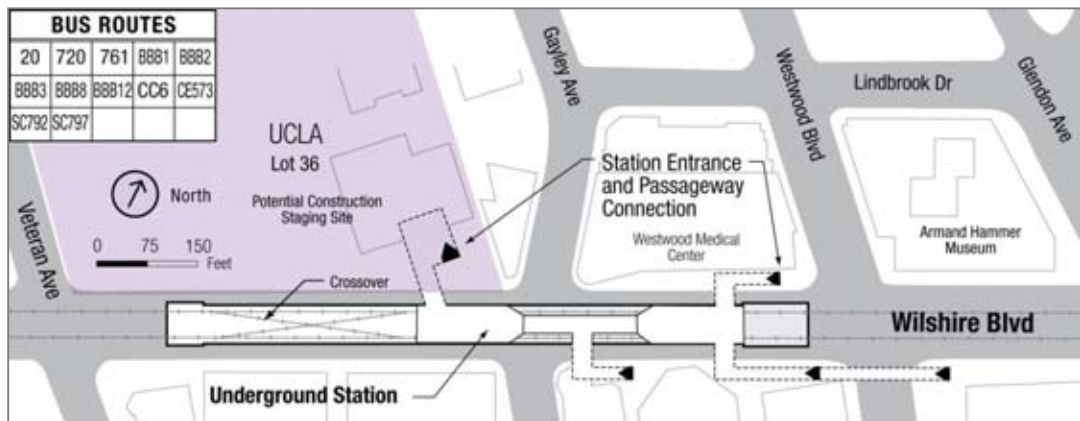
Westwood/UCLA On-Street Station (Option 5)
